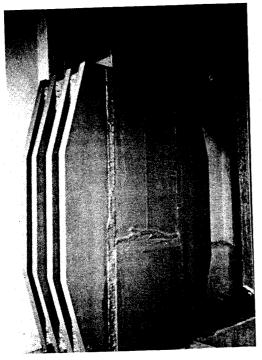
Welded of and addition of reinforcement plates to cracked columns in the Ashiyahama Residential Complex.
